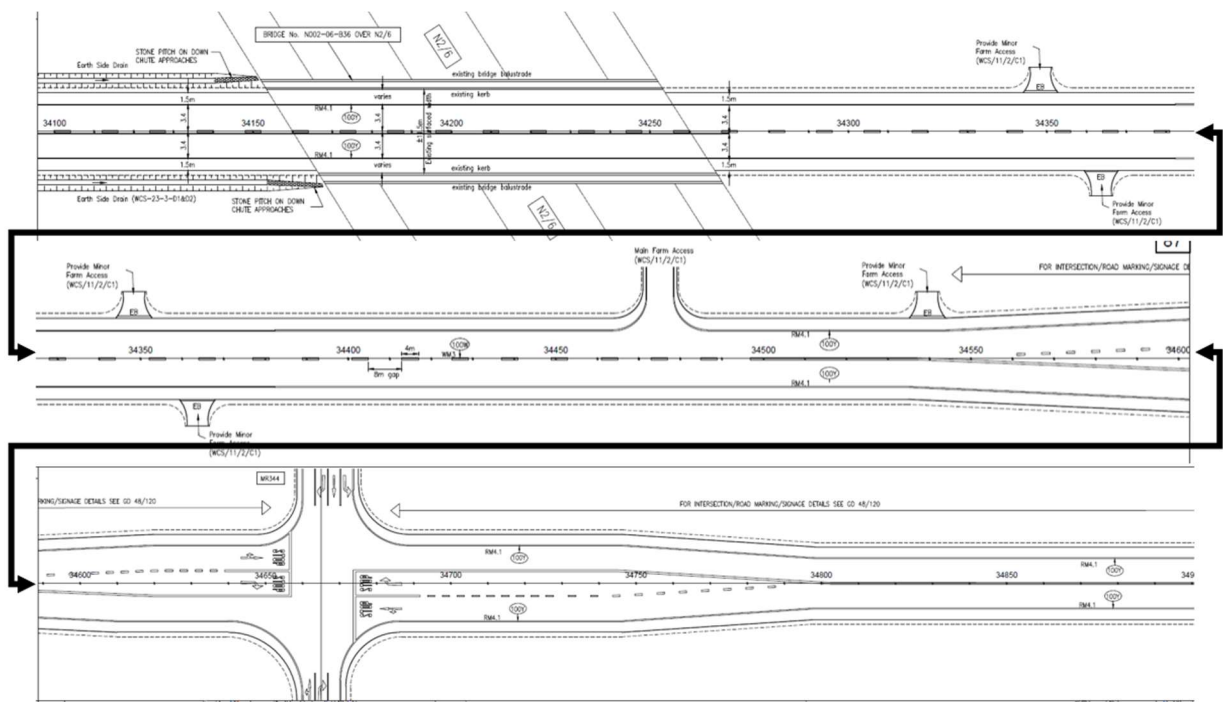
Kantey and Templer DR1578 Layout Plans
